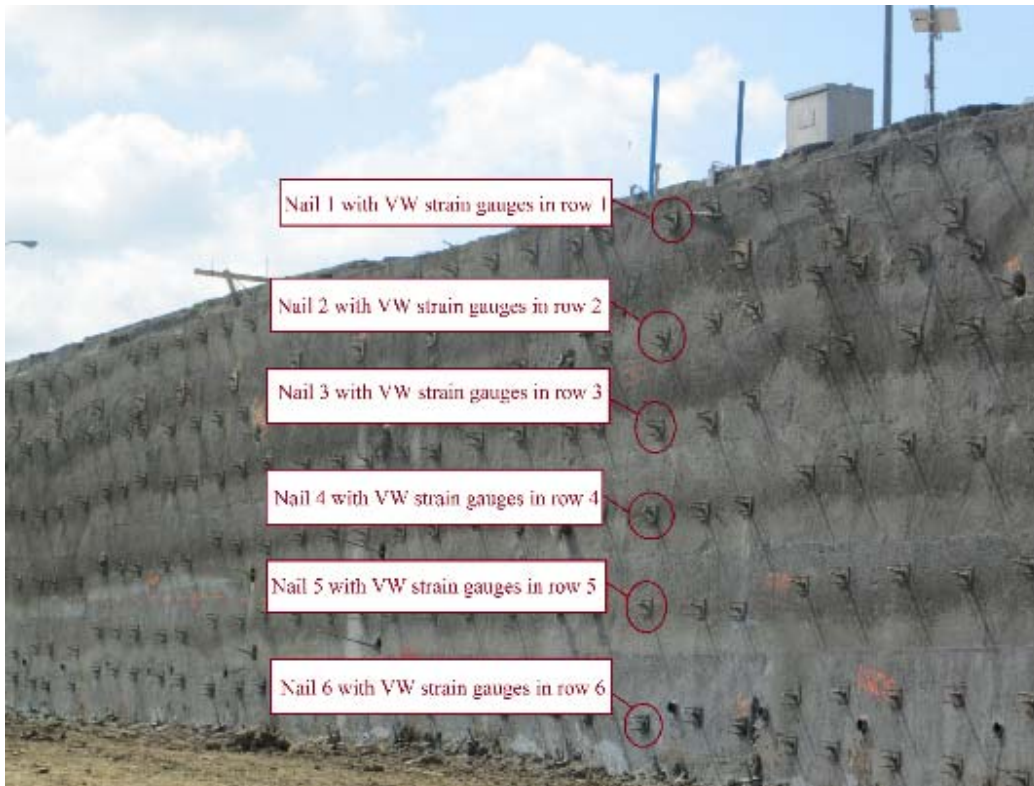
Location of the Instrumented Nails with VW Strain Gauges on Wall Profile at Station 1+98.
